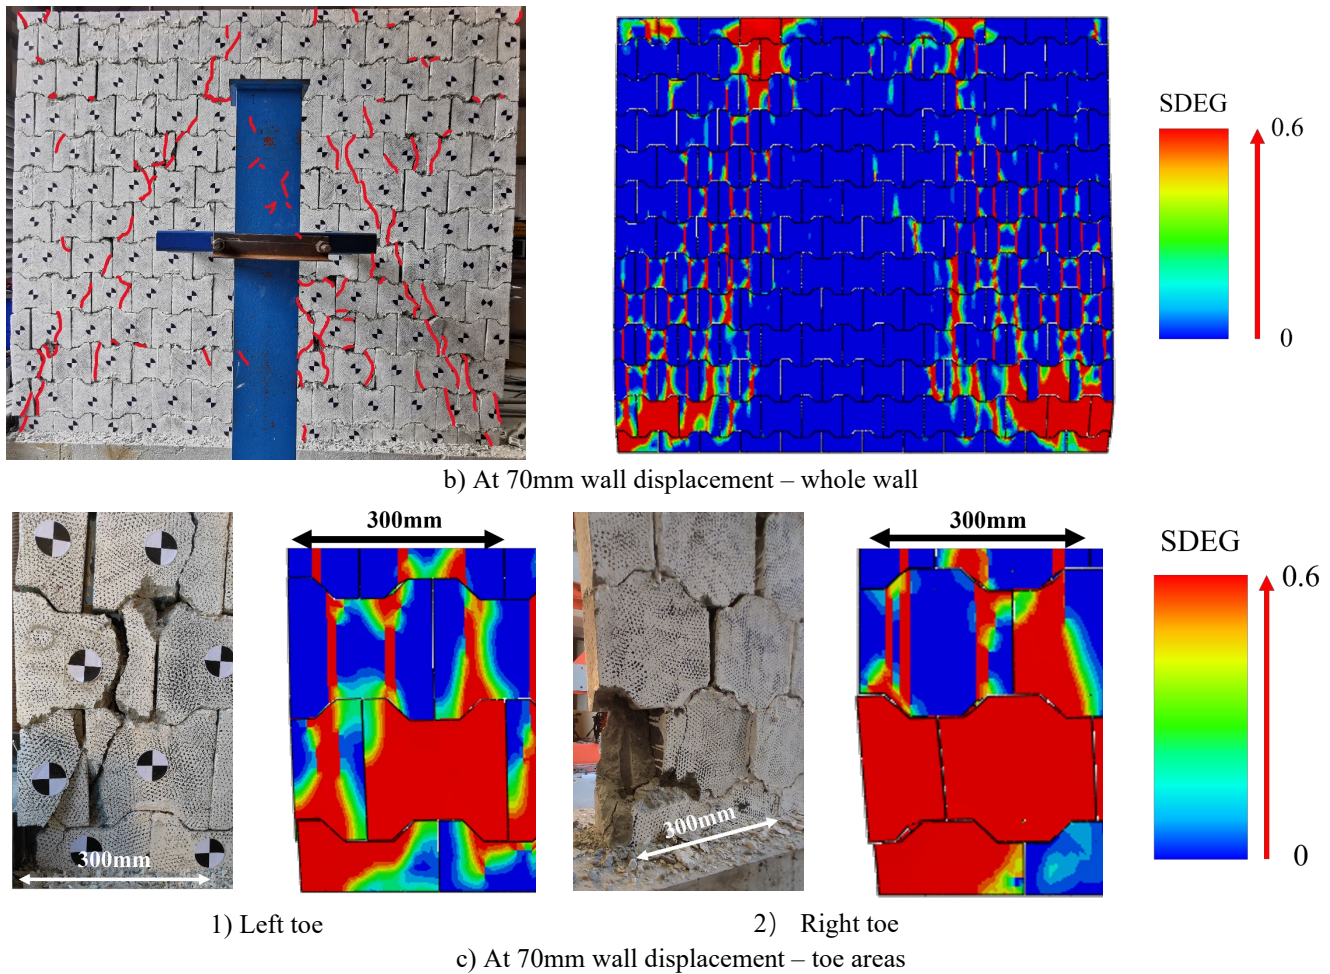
Comparisons of wall damages from laboratory test and numerical modelling
